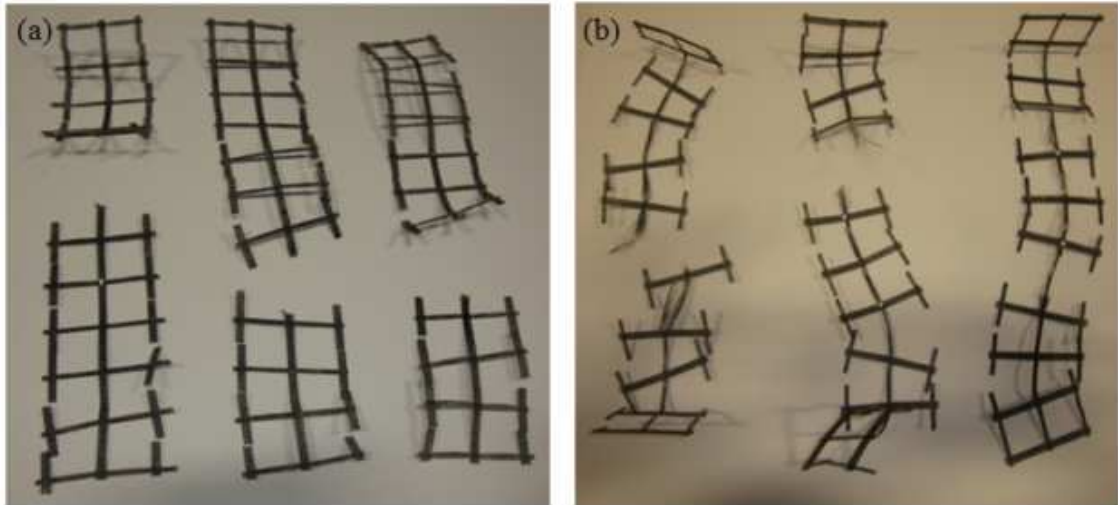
Damaged KGG1 geogrid rib strength test specimens after the test: (a) MD specimens, (b) XD specimens
